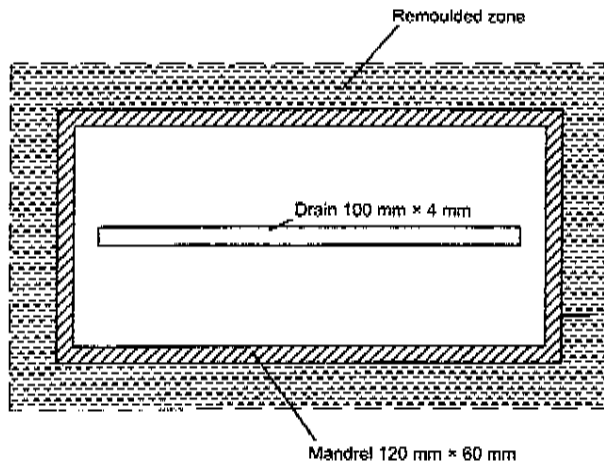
Cross-sectional dimensions of the Mebradrain installed and of the mandrel utilized. The cross-sectional area of the remoulded zone indicated corresponds to the cross-sectional area of the mandrel (7200 mm²)
